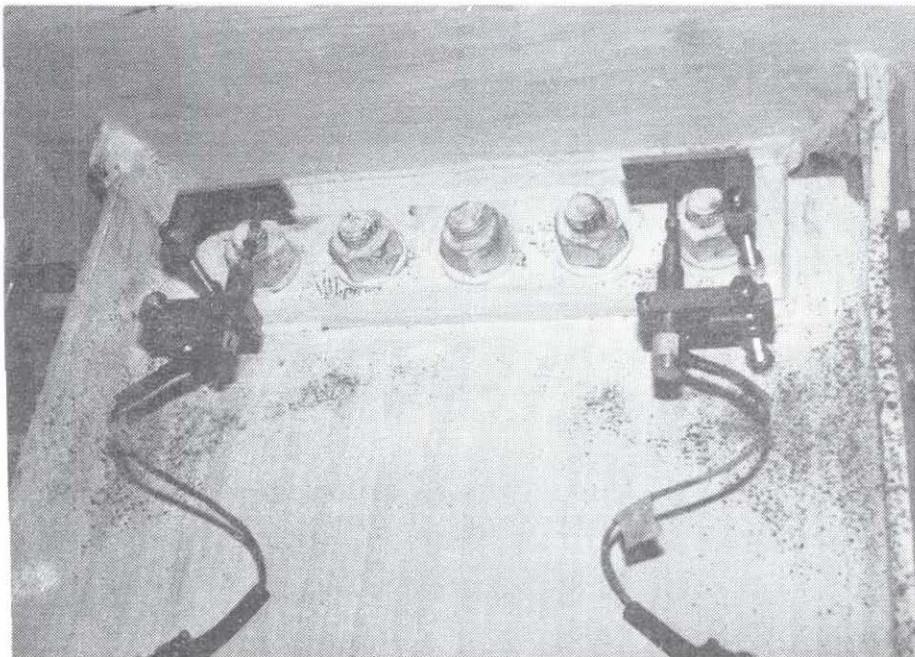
Flaking of Whitewash on Beam Flange and Web (Specimen 14)
